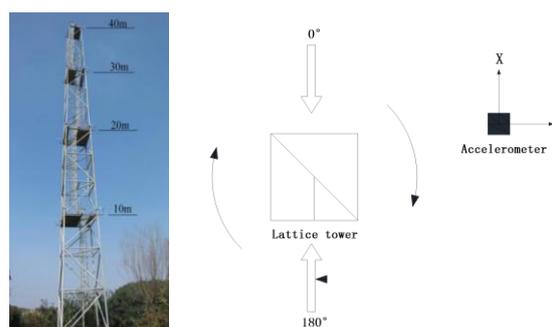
Steel-tube lattice tower and the layout of accelerometer
